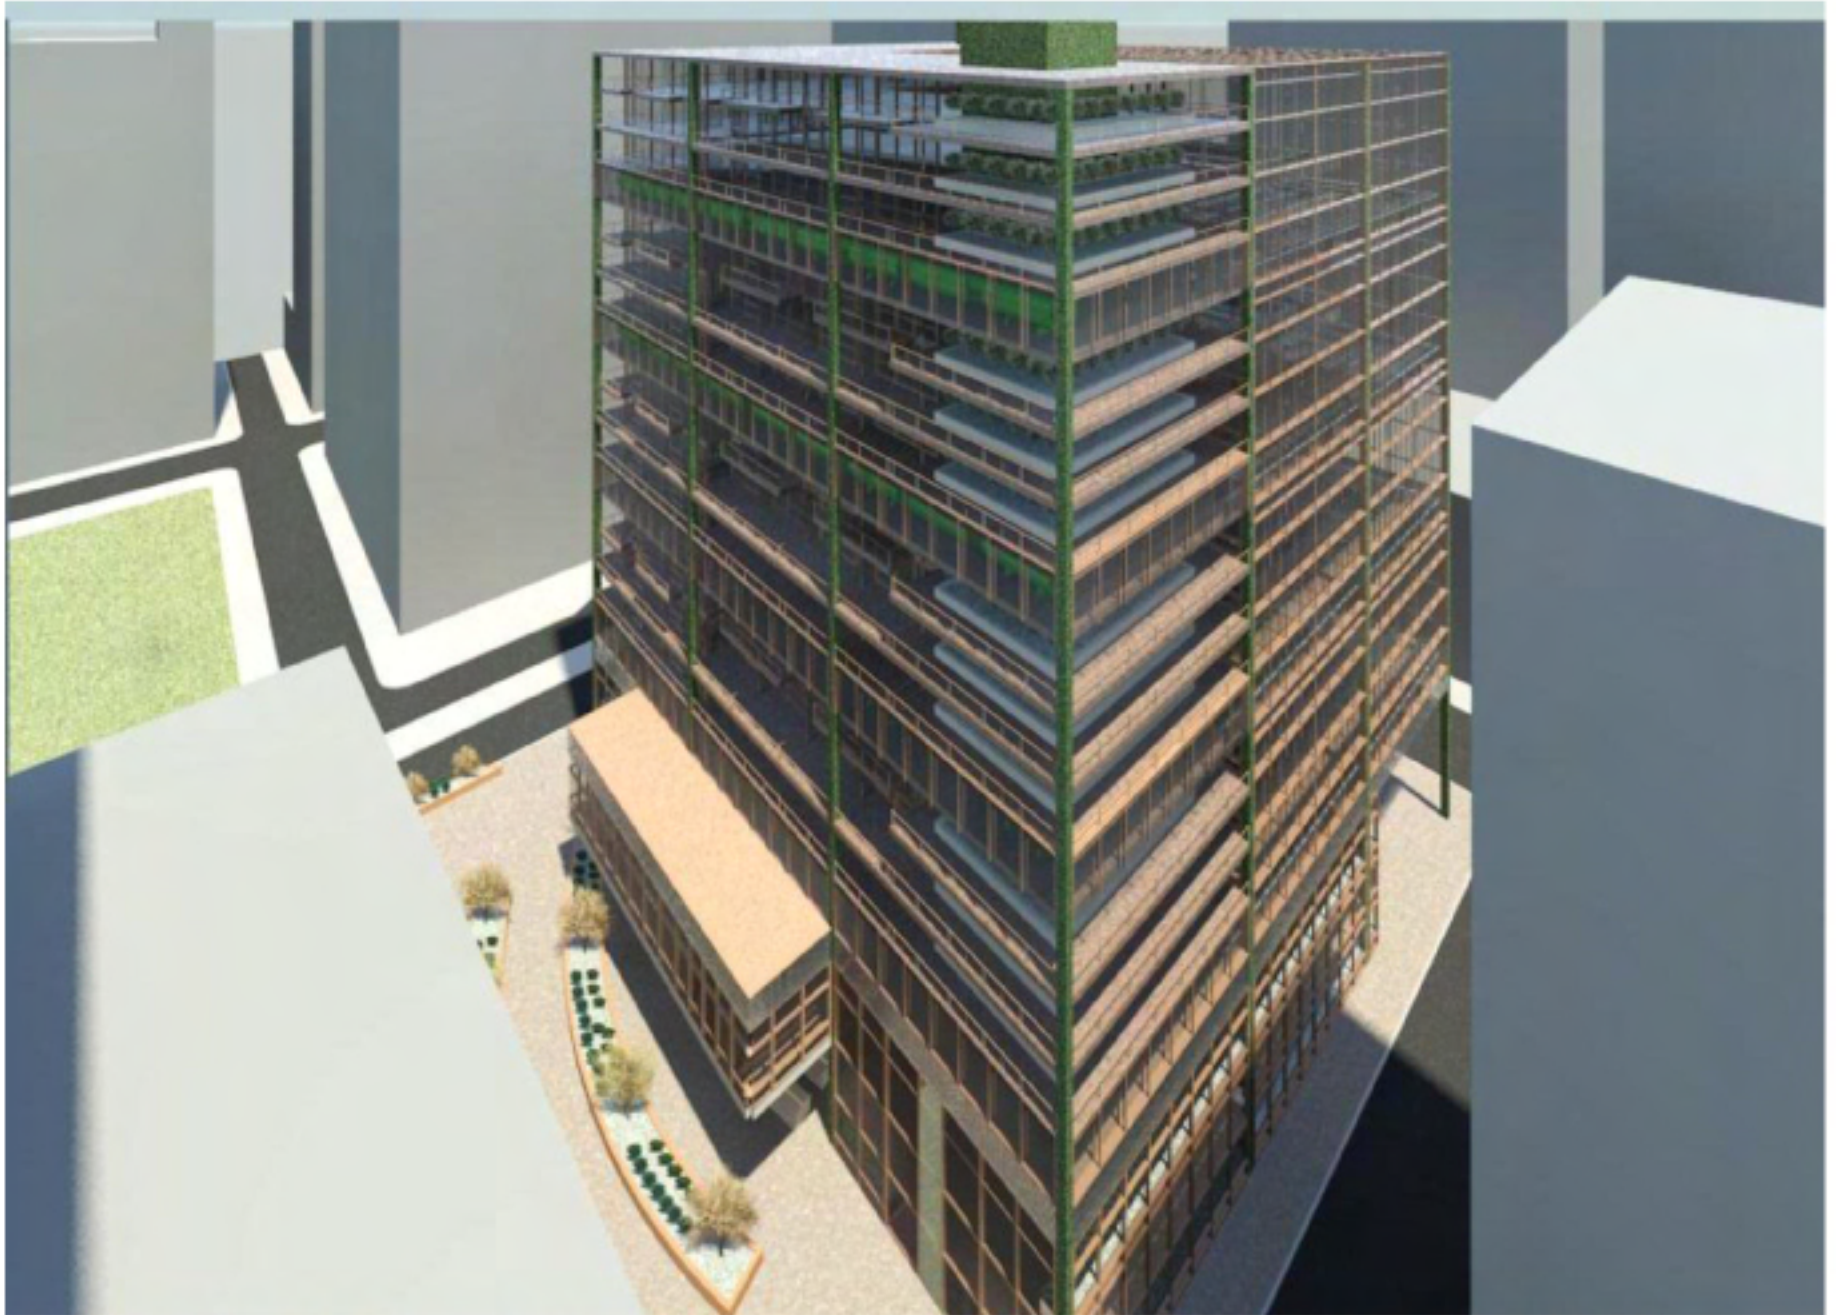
Aerial view from the West. The corner has out door growing plots, to the left are balconies for units and to the right is greenhouse. [Revit and Photoshop]
